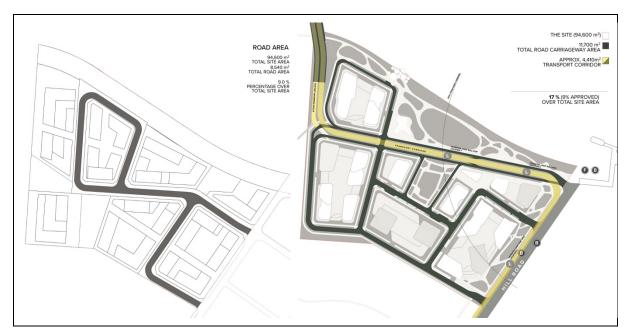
Approved Master Plan and Proposed Master Plan Street Network
